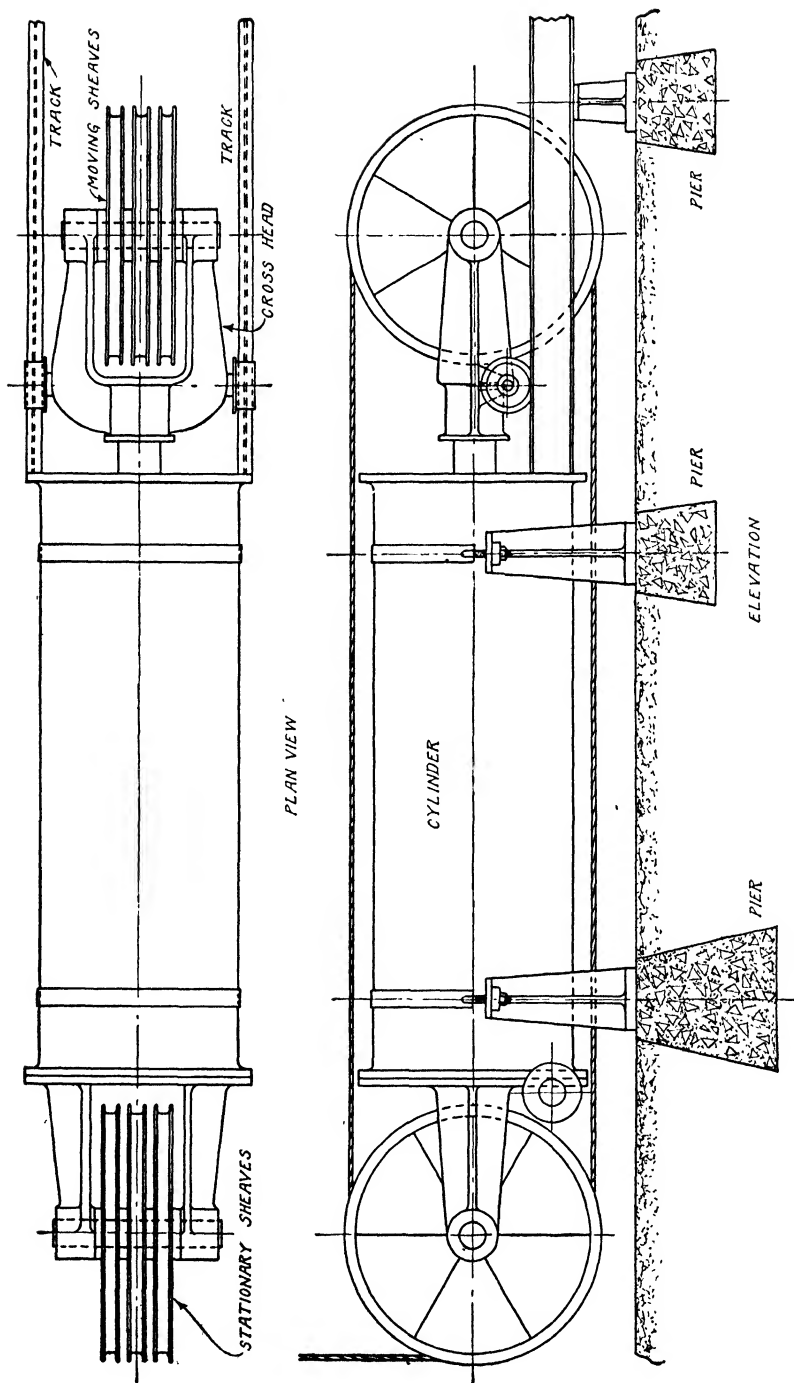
Horizontal Cylinder "Push-Type" Hydraulic Elevator
